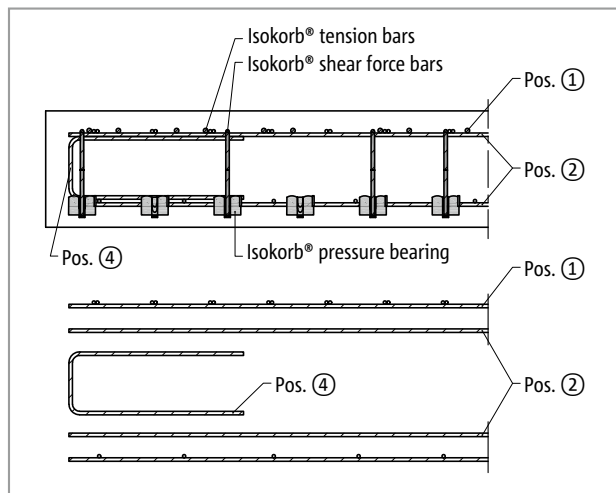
Schöck Isokorb® XT type K-M1 to M10: On-site reinforcement balcony side in section A-A; Pos. 4 = side reinforcement on the free edge perpendicular to the Schöck Isokorb®
